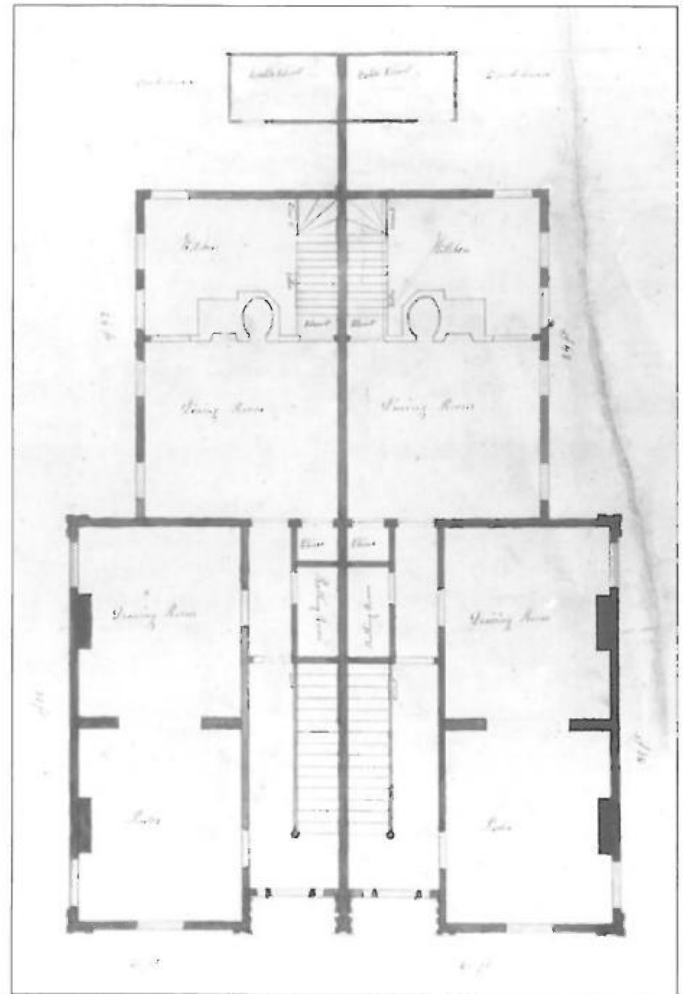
Floor plan of Double House by Thomas C. Huntress, 1846 (MHPC).
